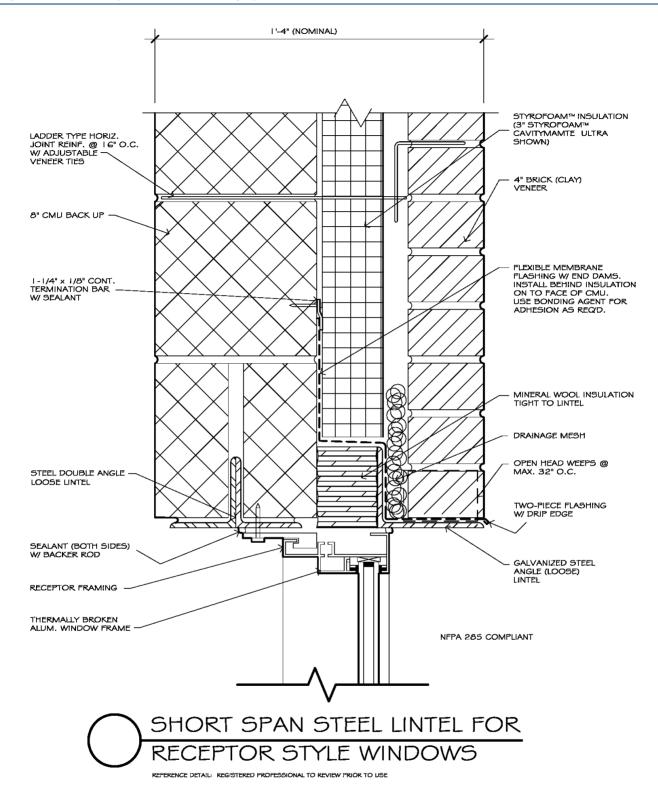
Window / Door Opening Detail w/Mineral Wool
